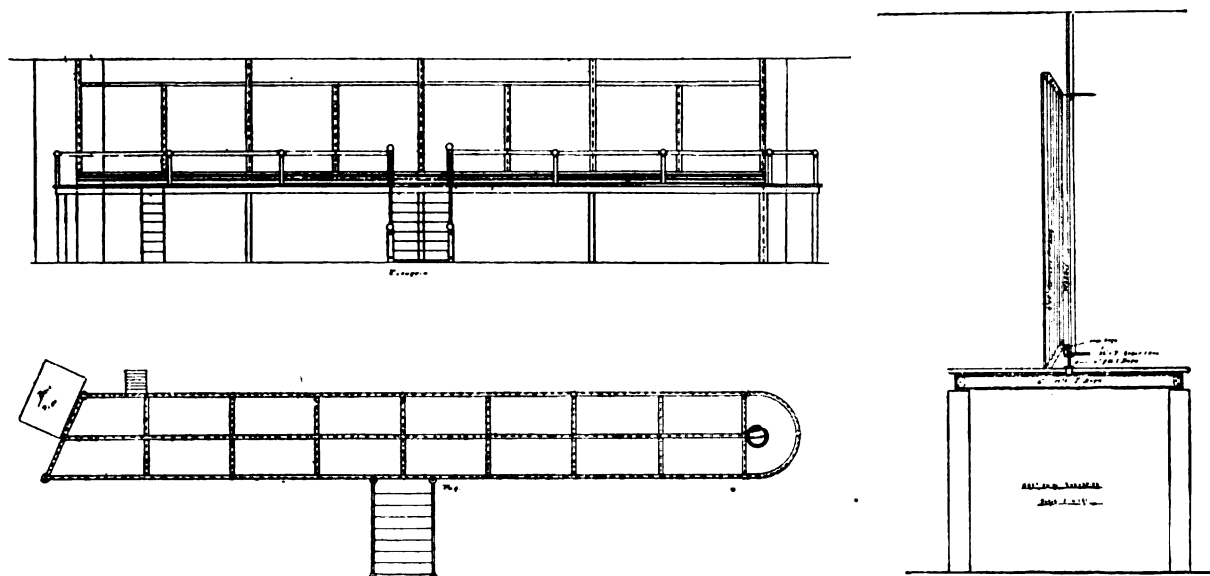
THE SWITCHBOARD, NEW SIEGEL-COOPER STORE.—PLAN, ELEVATION AND SECTION.
